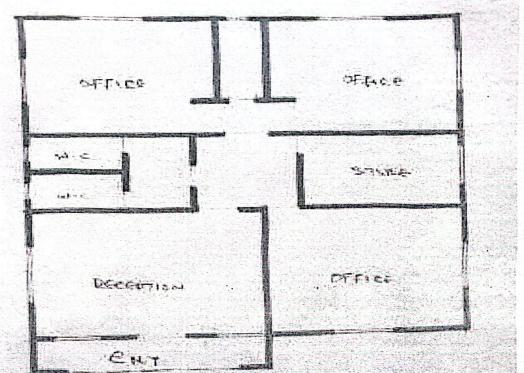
FLOOR PLAN SHOWING ADMIN. BLOCK OF CASE STUDY FOUR LOCATED AT EWUALA STREET, IKORODU LAGOS STATE
